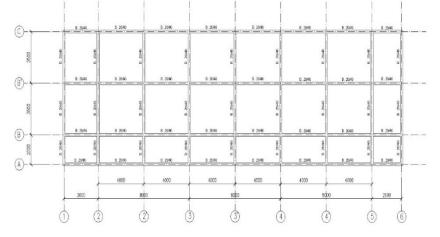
Building ringbalk floor plan TK B Source : Personal document image
